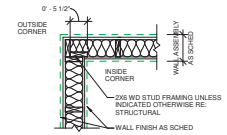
DETAIL-SECTION-WD-GCU-WALL-INTERSECTION 3
